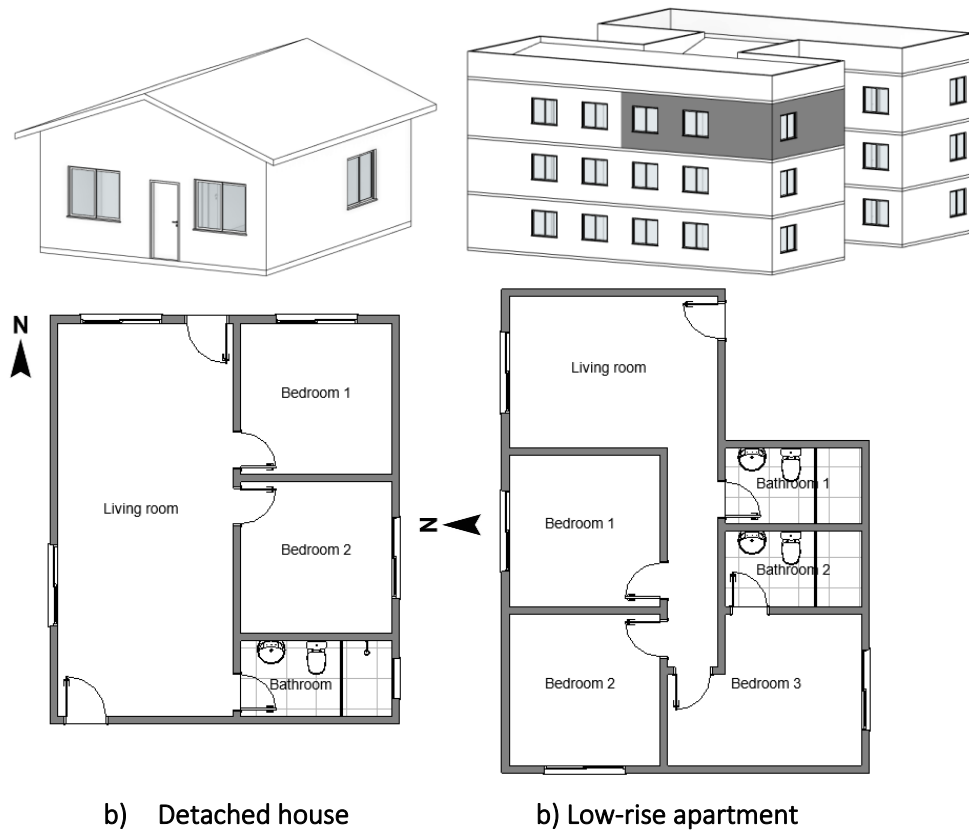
3D views and floor plans for: (a) Detached house, and (b) Low-rise apartment.
